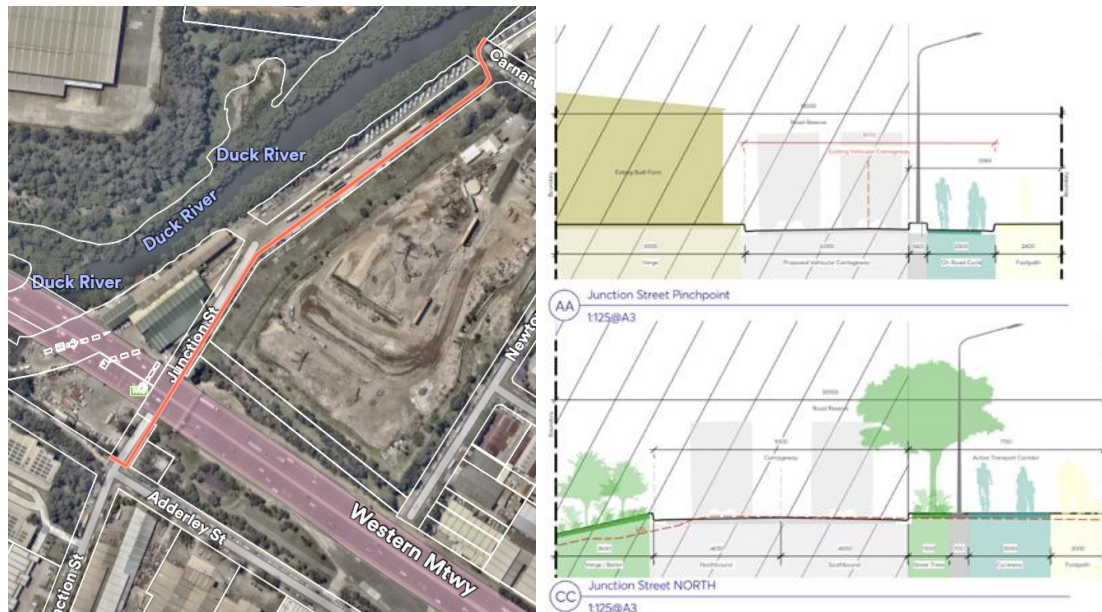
& 3: Location and indicative cross-sections of Junction Street.
